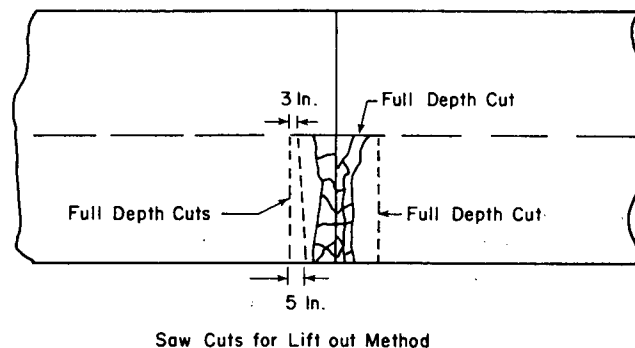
Saw cut locations for lift out method of concrete removal (note: because of equipment limitations, it may be necessary to cut the slab into smaller pieces).
